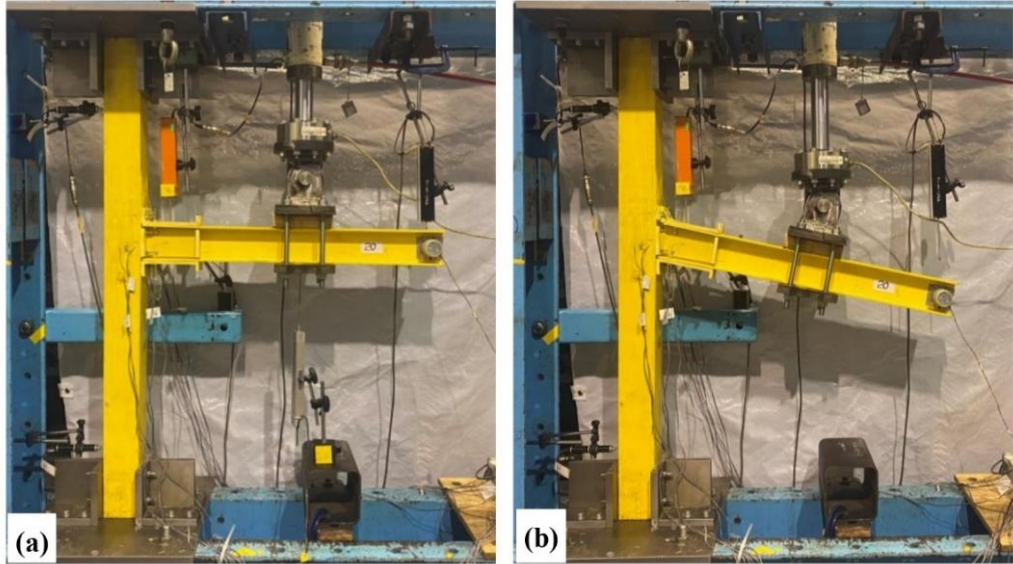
Actual photo of the beam-to-column joint test arrangements: (a) Photo before the test; (b) Photo of the tested sample
